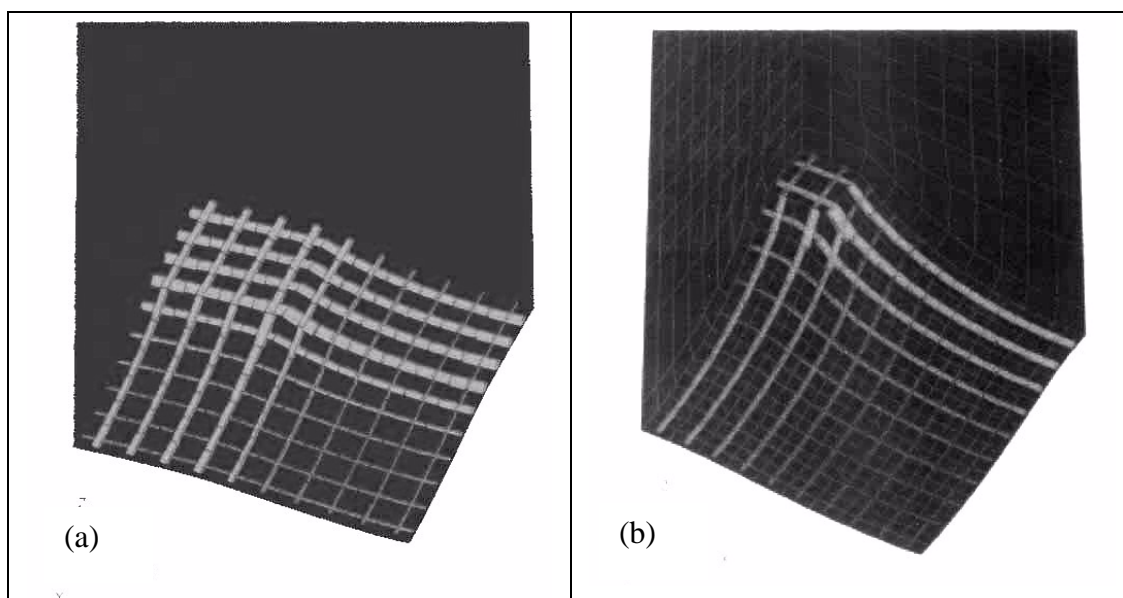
Distribution of reinforcement tension in (a) Embankment A and (b) Embankment B (after Russell & Pierpoint, 1997).
